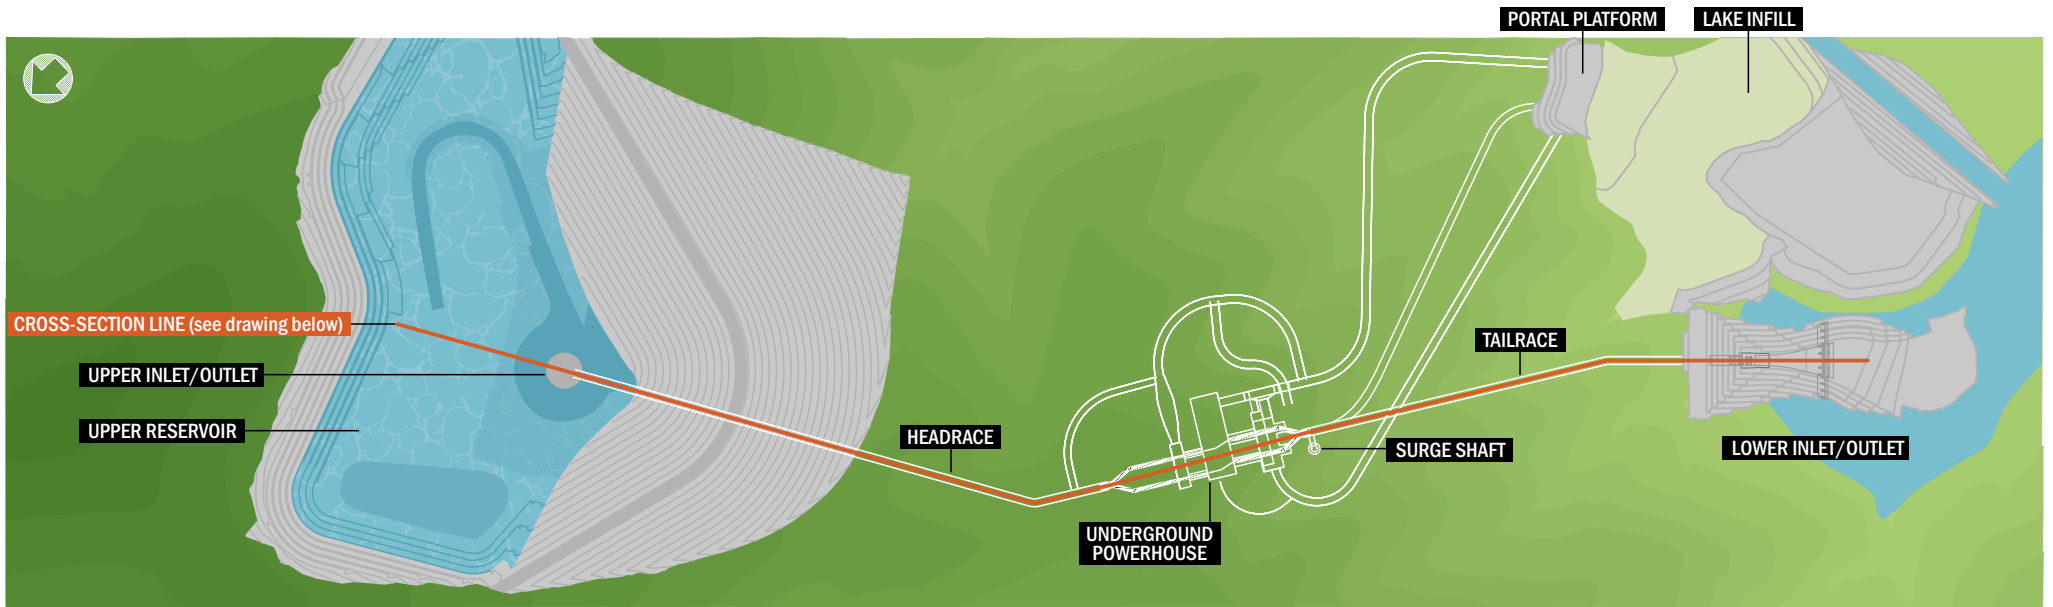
Powerhouse and waterway arrangement – plan view and section
